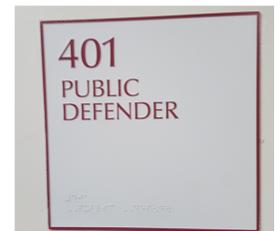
PHOTO OF EXISTING ROOM NUMBER AND ROOM NAME PLATE (C)
